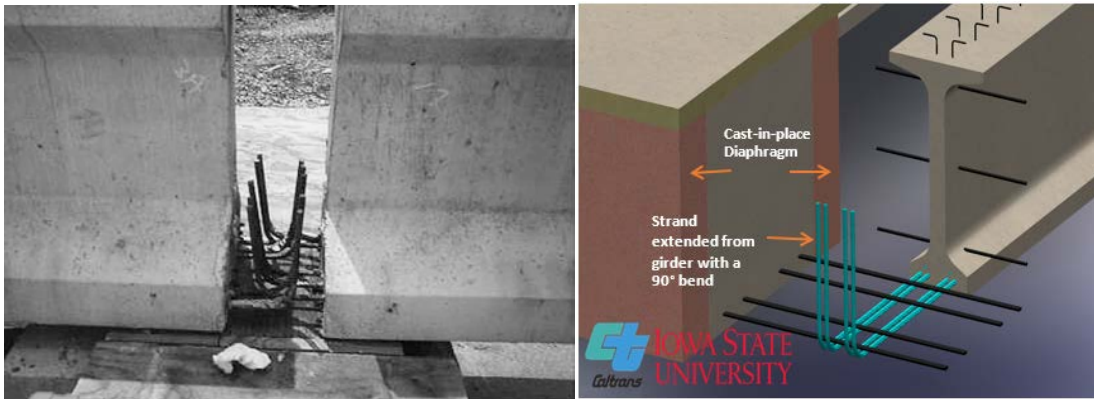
Extended mild steel reinforcing bars (left) (NCHRP, 2004); extended strands and dowel bars placed through the girder web (right)
